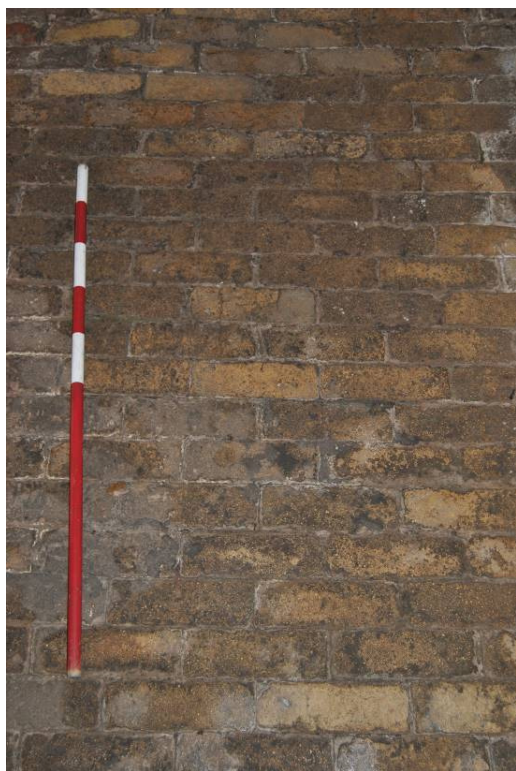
Worn, buff brick flooring adjacent to primary door [d21].
